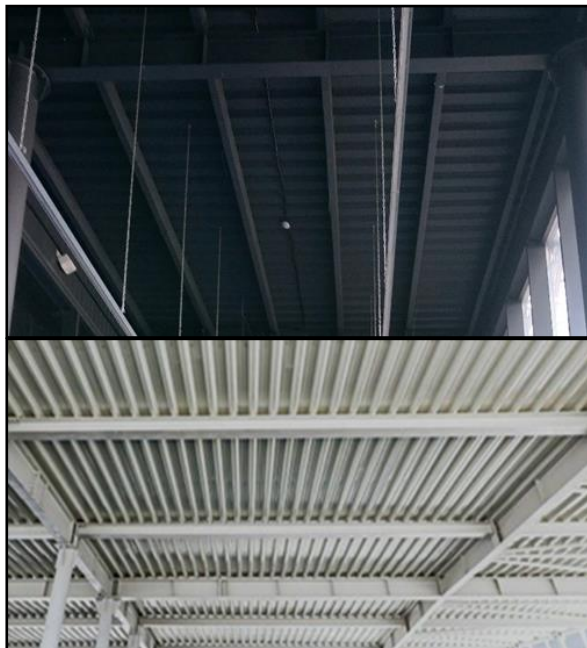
View of the flat roof structures on I-beams in the transverse and longitudinal directions
